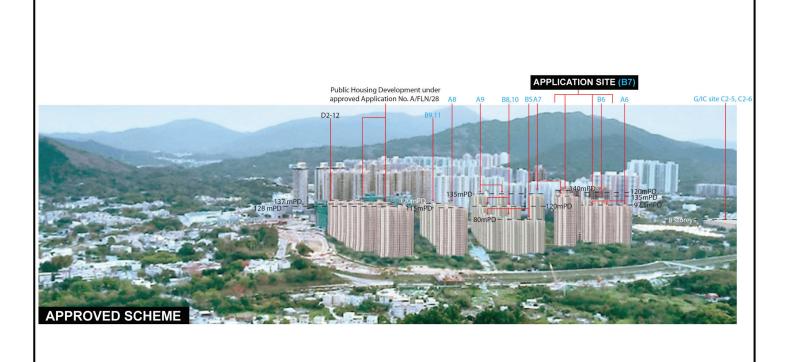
VIEWPOINT A5 : VIEW FROM LING SHAN ROAD
